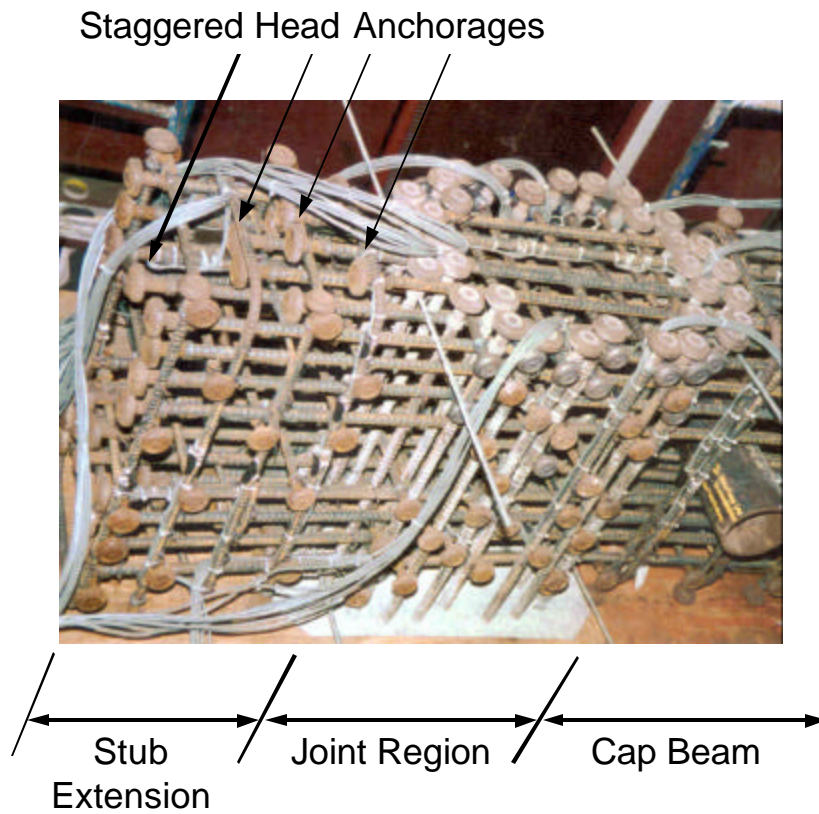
Photo of cap-beam/column joint reinforcement from U.C. San Diego study [62]
